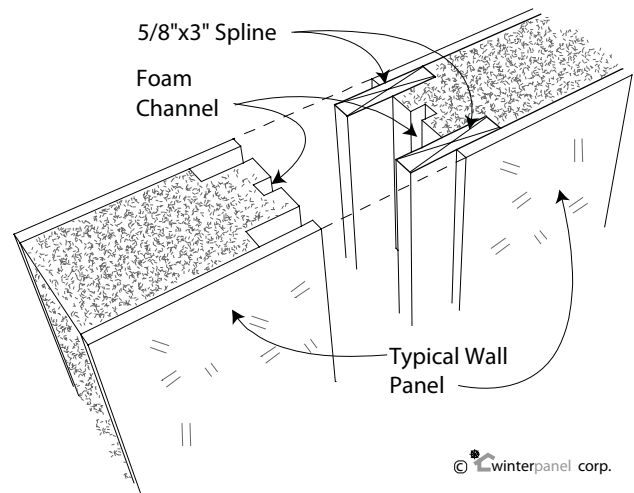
Panel layout for First Wall. Lay panels out on deck. Join panels before tilting wall up onto bottom plate.
